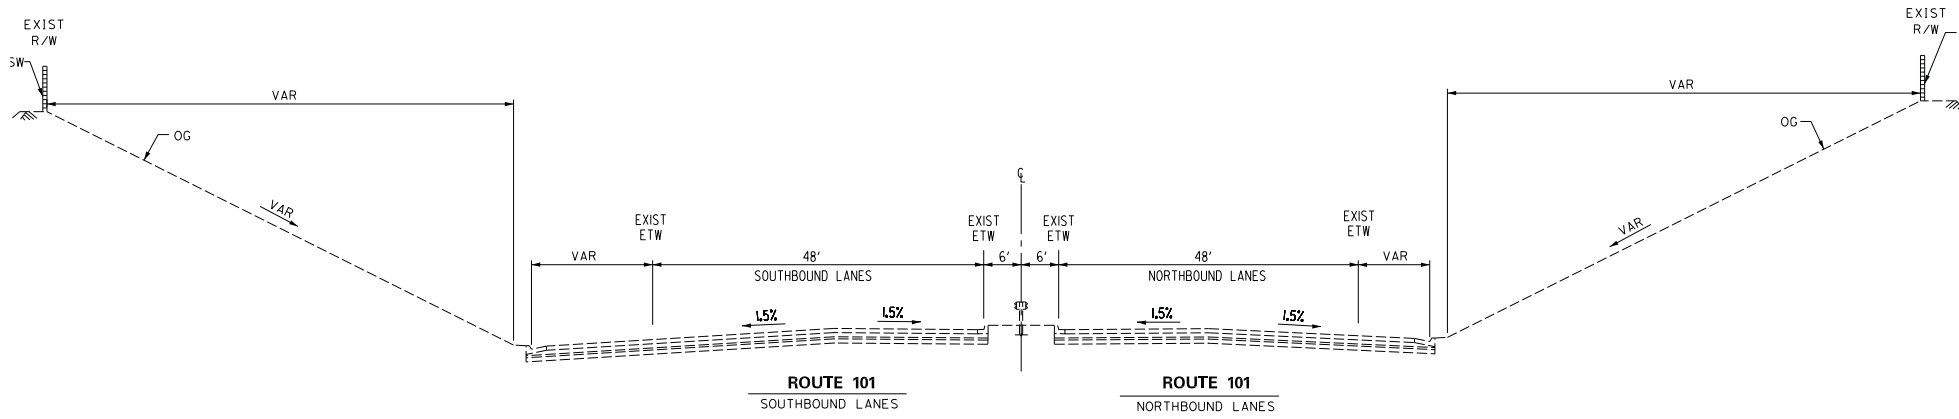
Existing Freeway Typical Section Between Fountain Avenue and Wilton Avenue
